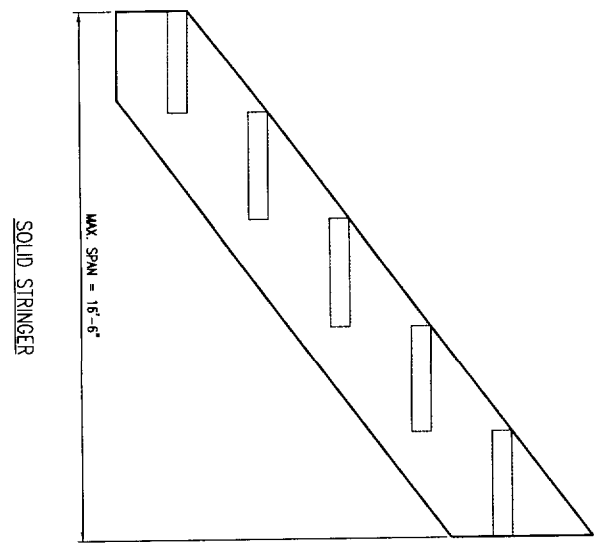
STAIR STRINGER CONNECTION DETAIL
